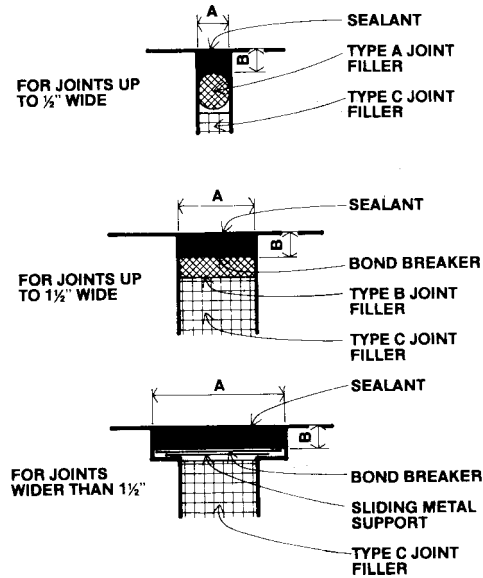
Wet Sealant Details at Wearing Surface (see 15.2.6)
